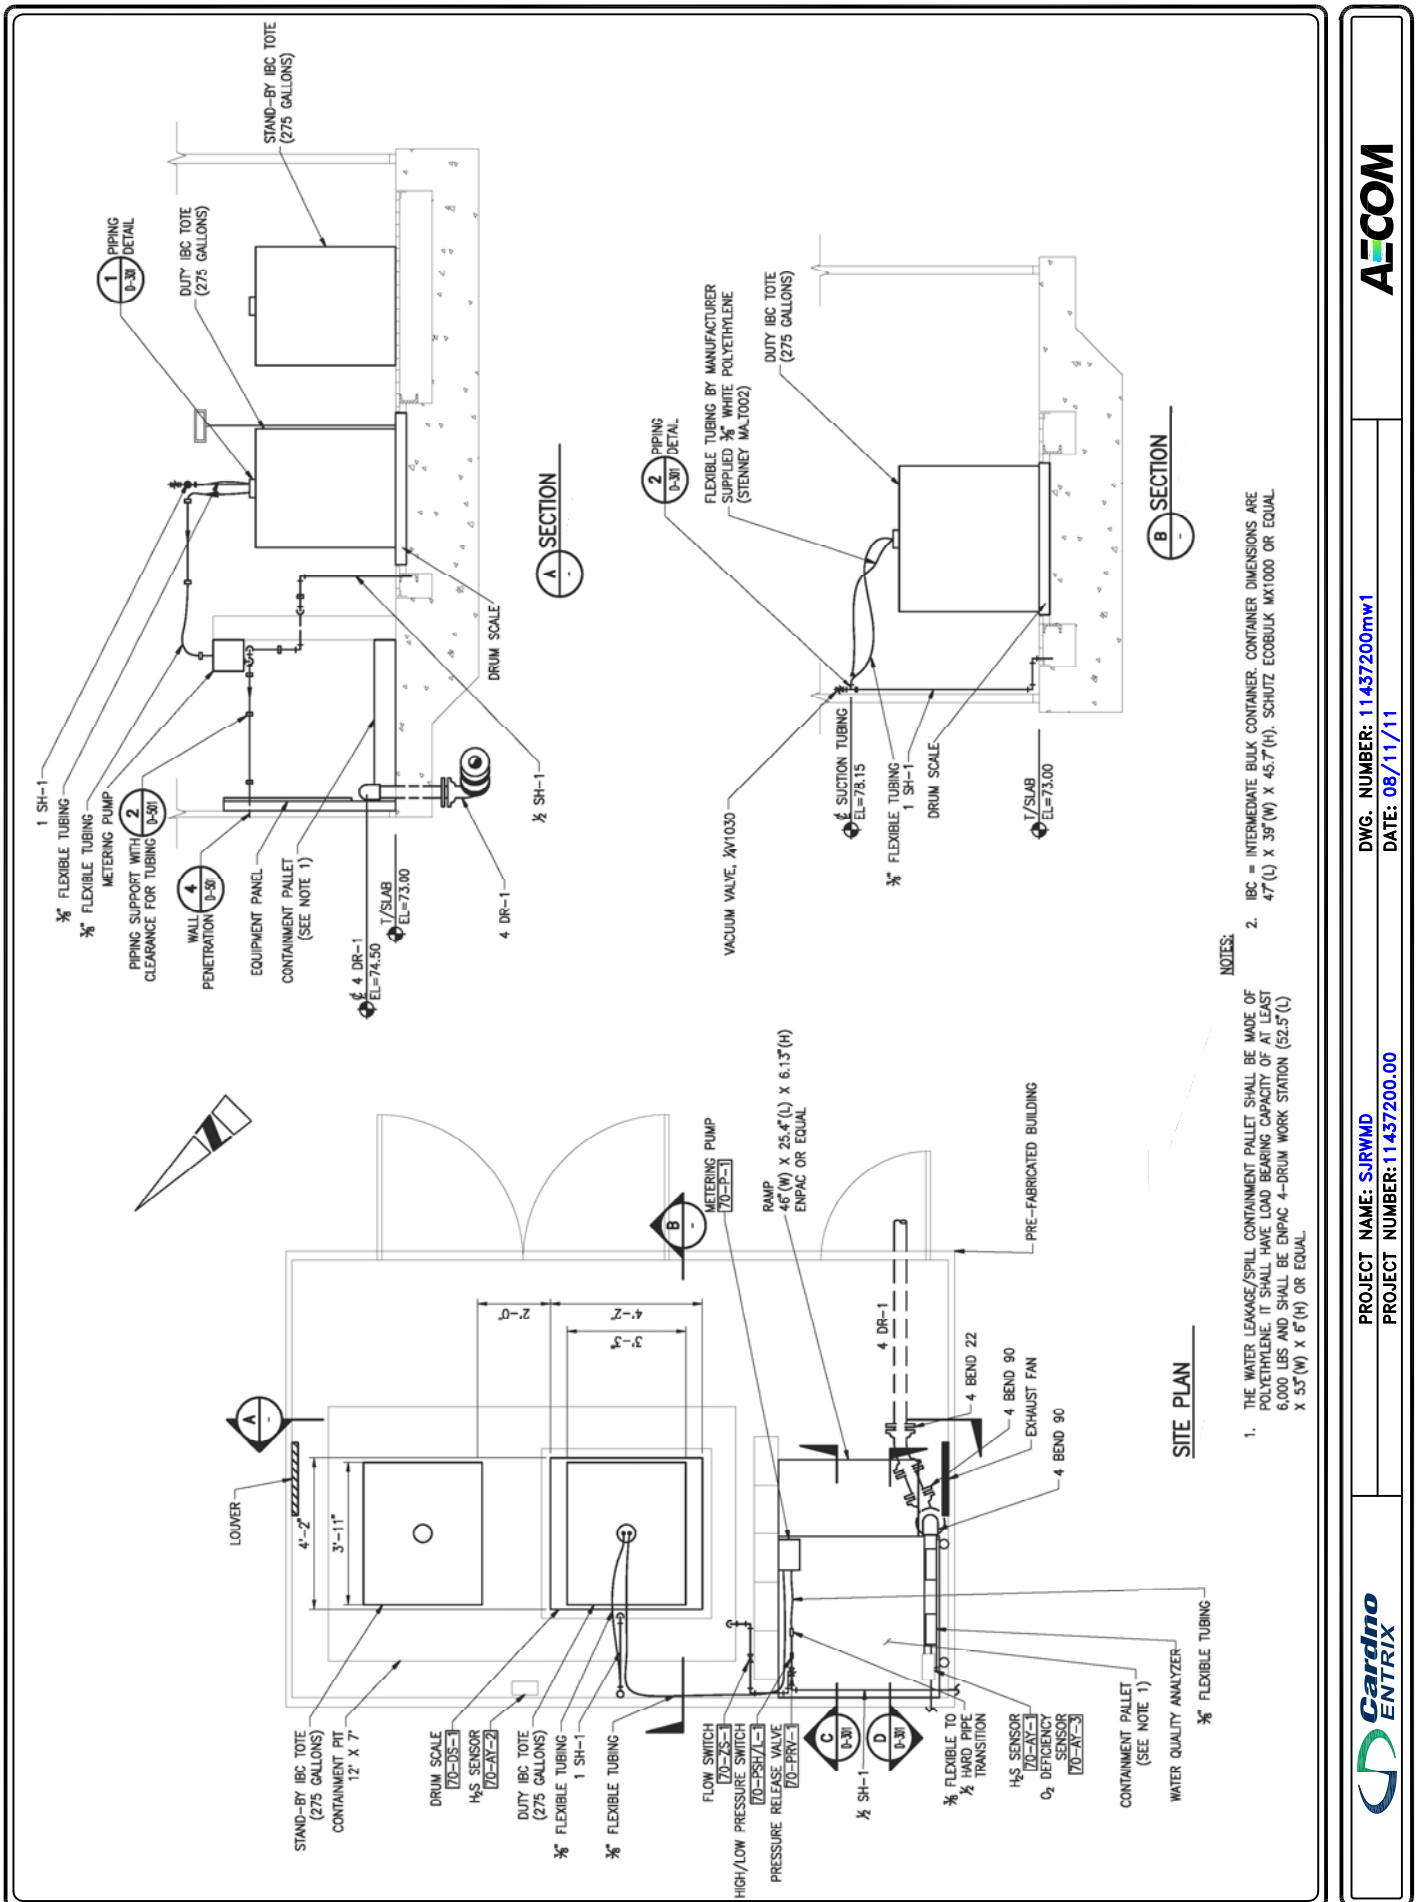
PROPOSED DESIGN OF PRETREATMENT SYSTEMS.
